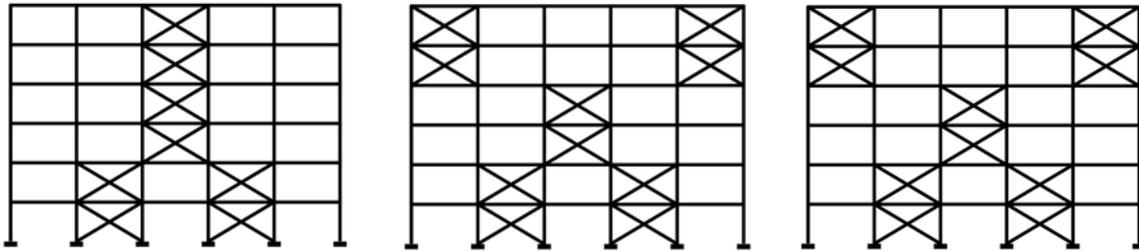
Brace placement of the 5-span, 6-story concentrically braced steel frame structure.
